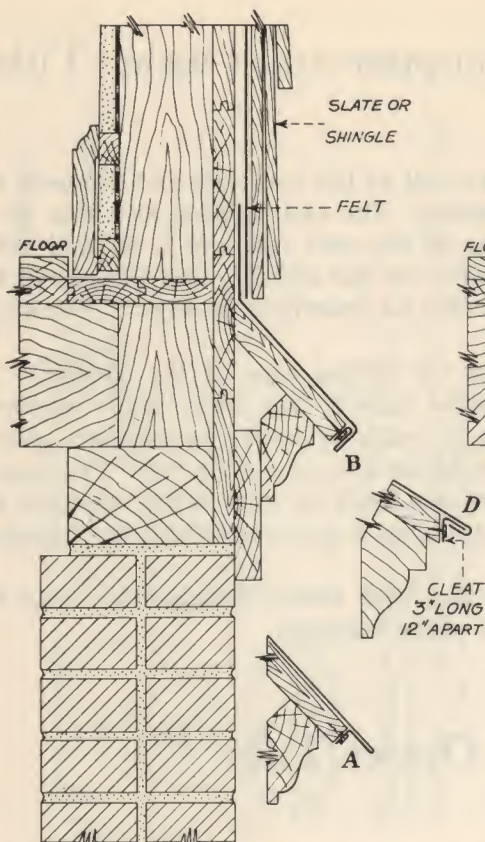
FLASHING WATER TABLE ON SLATE OR SHINGLE WALL - SCALE $1\frac{1}{2}" = 1'-0"$
